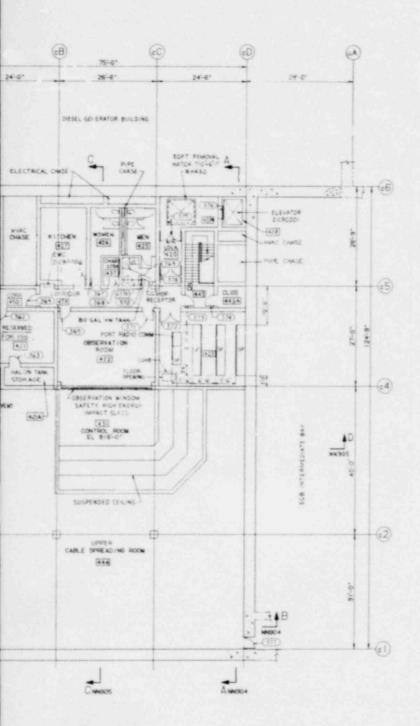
General Arrangement Control Building E1. 880'-0" and 863'-3"
